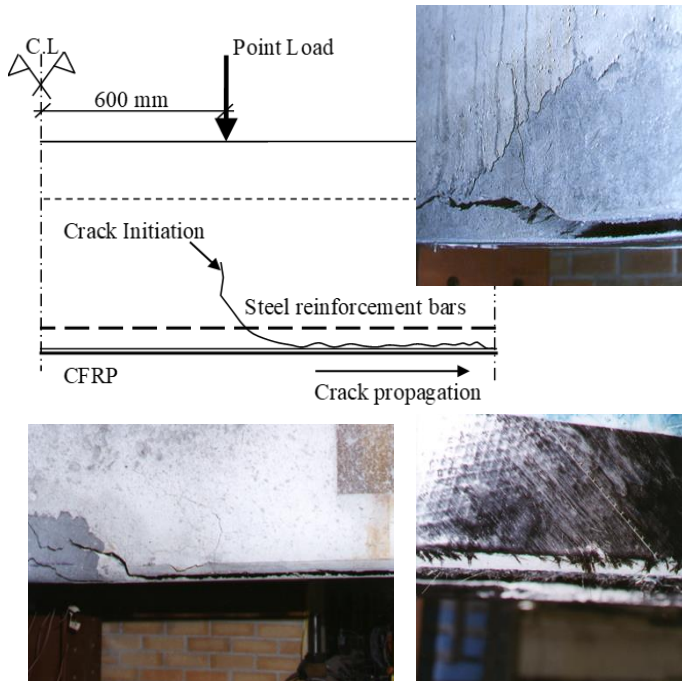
Crack propagation and strip separation from the soffit of the girder (above), and CFRP strip debonding with tearing of the CFRP sheet (below).
